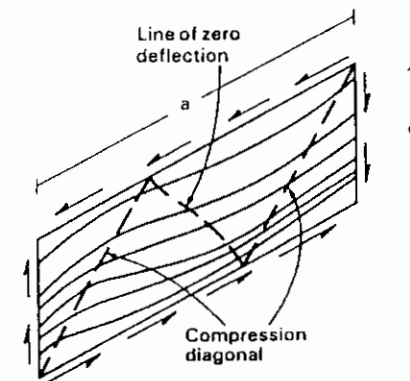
Buckling of a girder web in shear. (After ref. 6.)
